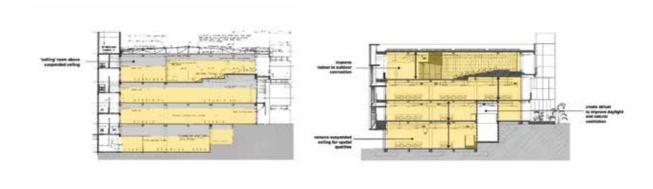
Indicative section with original suspended ceilings and compressed floor volumes before refurbishment (left). Proposed section showing changes improving daylight access and ceiling height (right).
